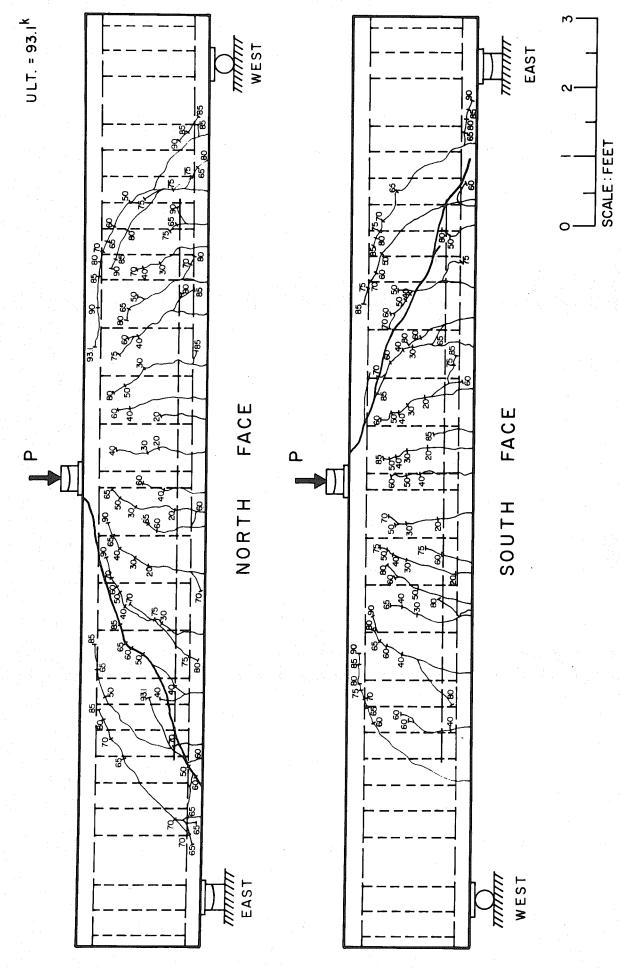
K BEAM 3WCA-I CRACK PATTERN
